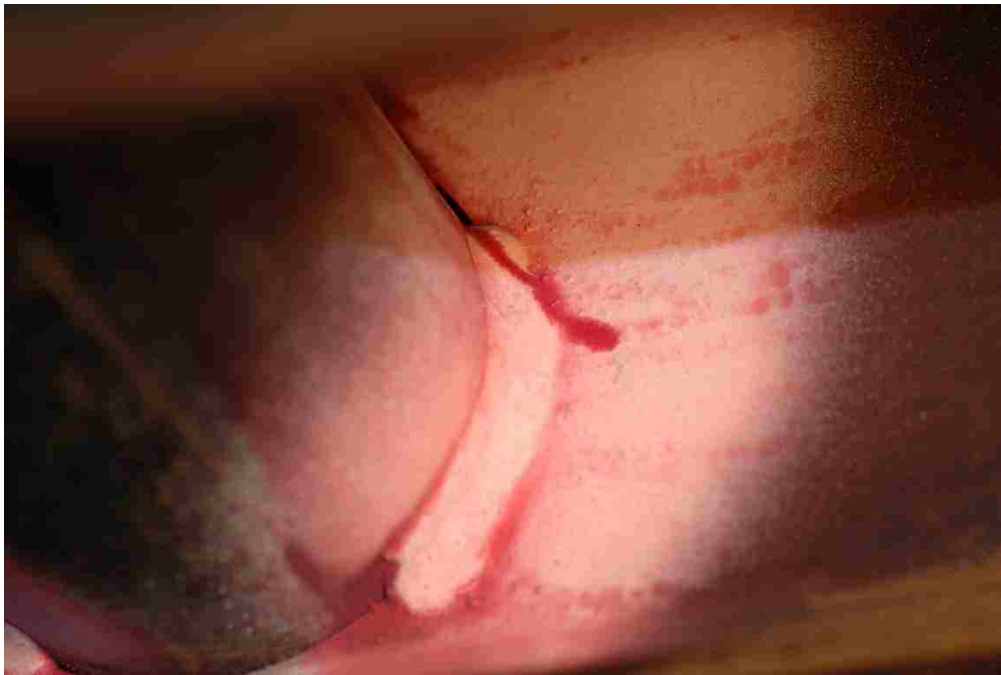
Specimen #2, crack at west weld of the S7-T1 intersection
